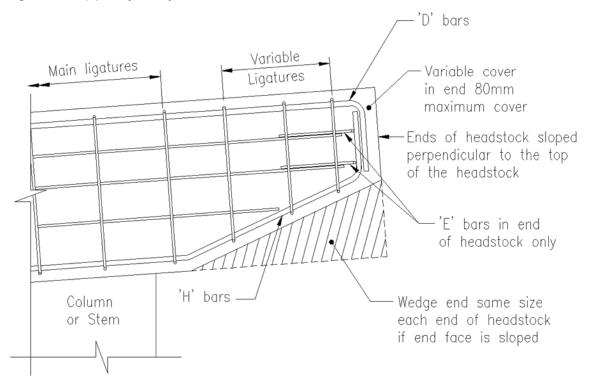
(b) - Tapered pier headstocks – Reinforcement
